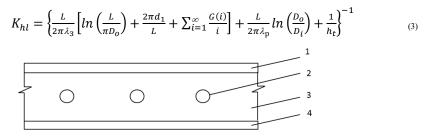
The scheme of warm floor: 1-layer of linoleum; 2-pipes; 3-concrete layer; 4-wood floor.
